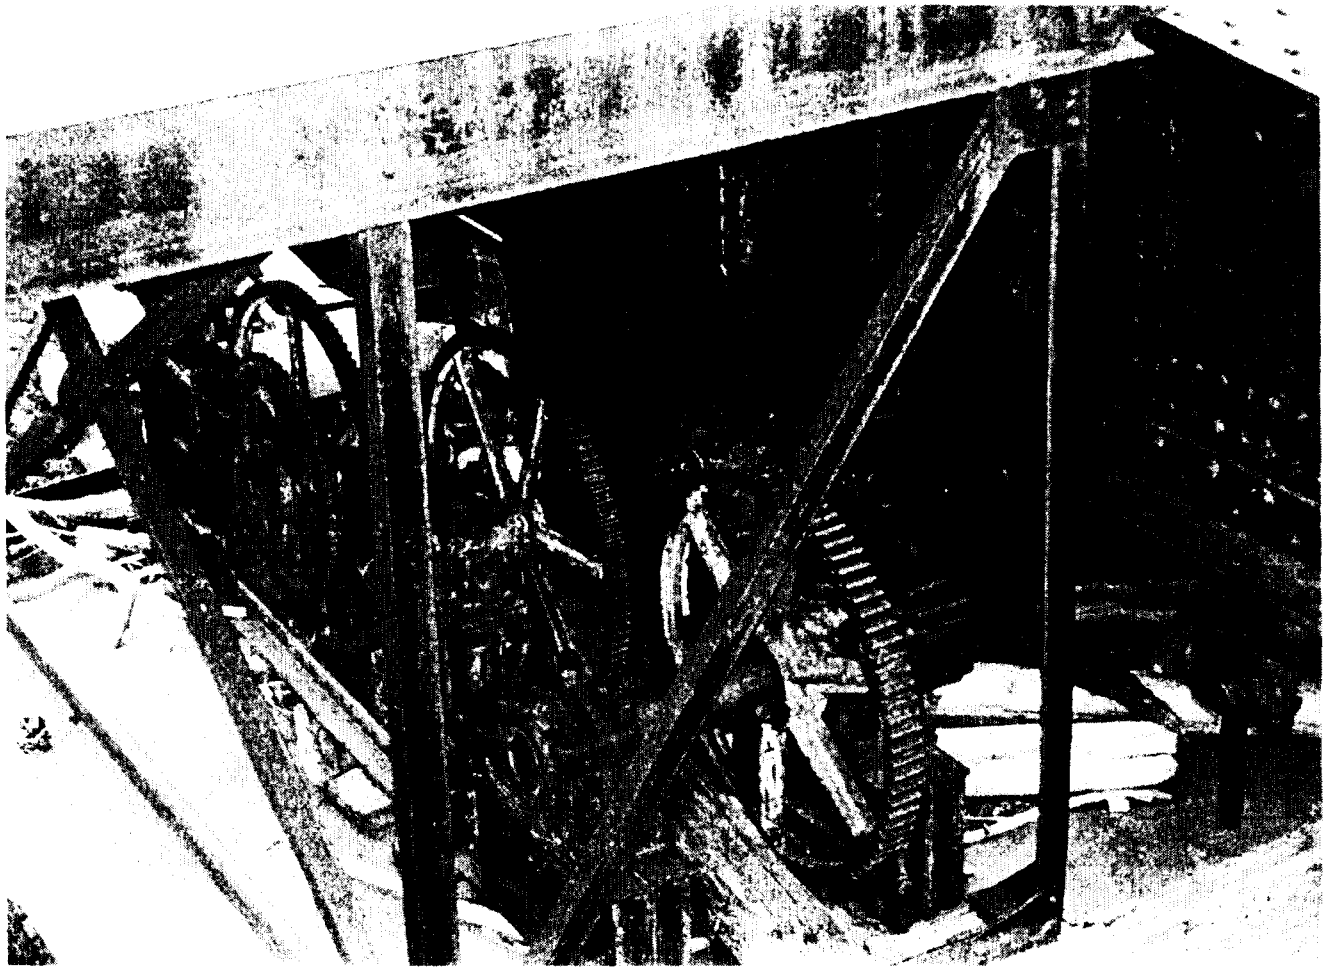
View of portion of bridge operating machinery in place beneath operator's house. View to northeast.
